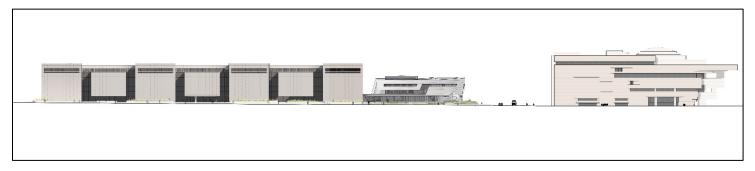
Proposed south elevation of the addition. Note the main mass of the new construction set back, and leaning away from the NASM, to allow the east elevation to remain visible and create a visual separation between the museum and the BLC. (Perkins&Will, 2024)
